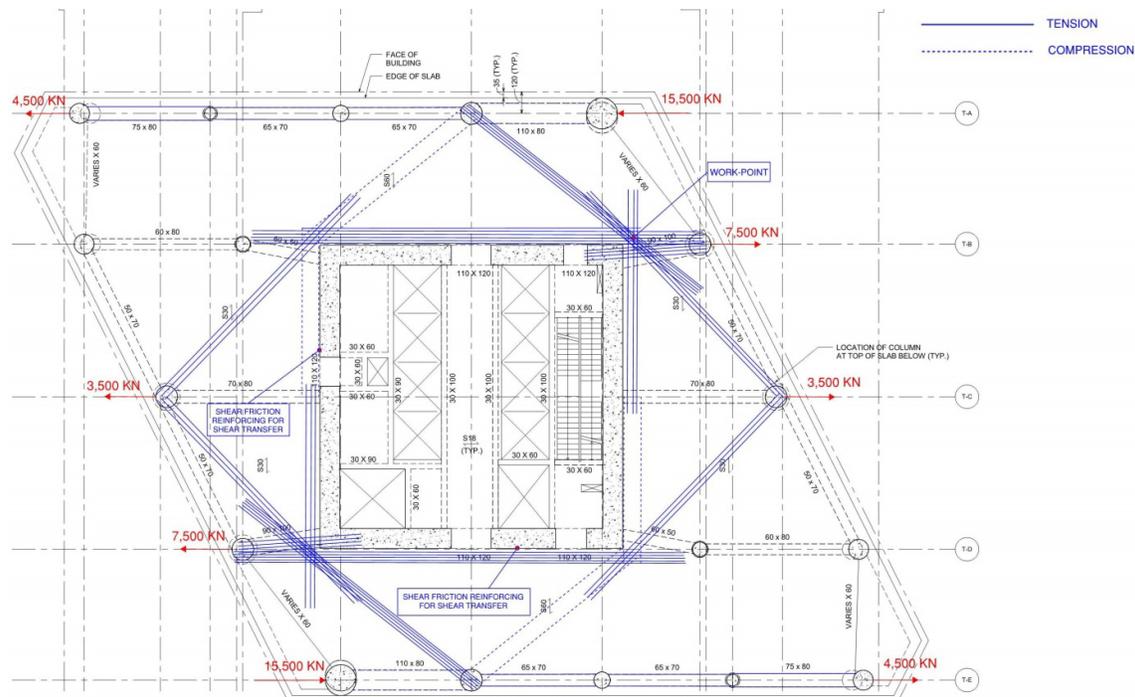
Load path within the 3rd floor to transfer horizontal kick forces into the concrete core
